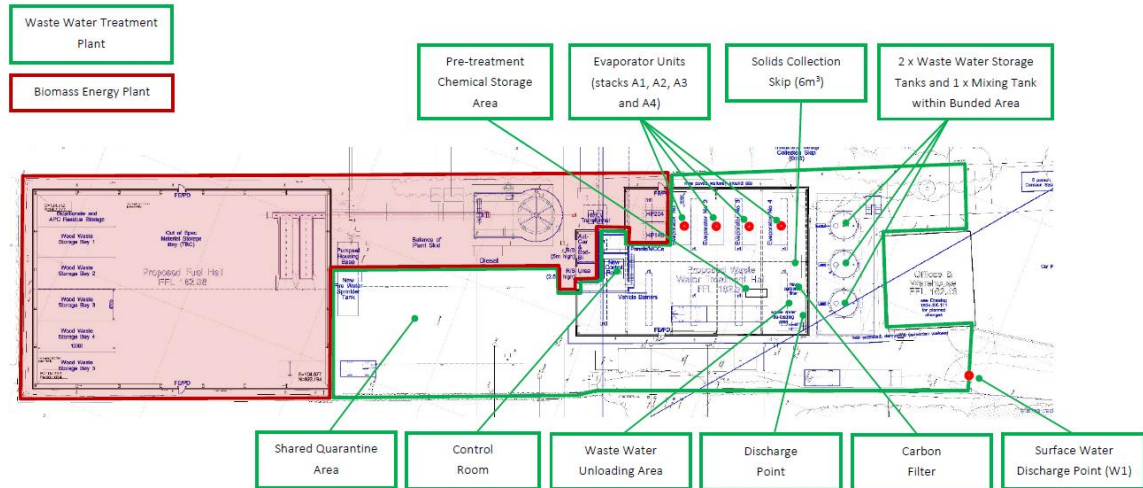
Site Plan Showing the Proposed Development and Surrounding Site
